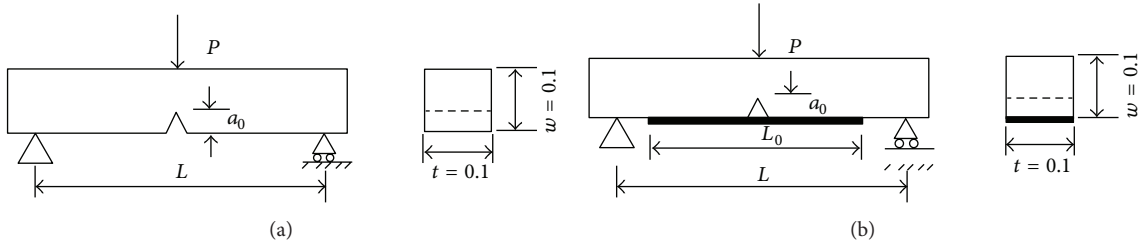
The geometrical model of the concrete beam. (a) The plain concrete beam. (b) The beam strengthened with CFRP.
